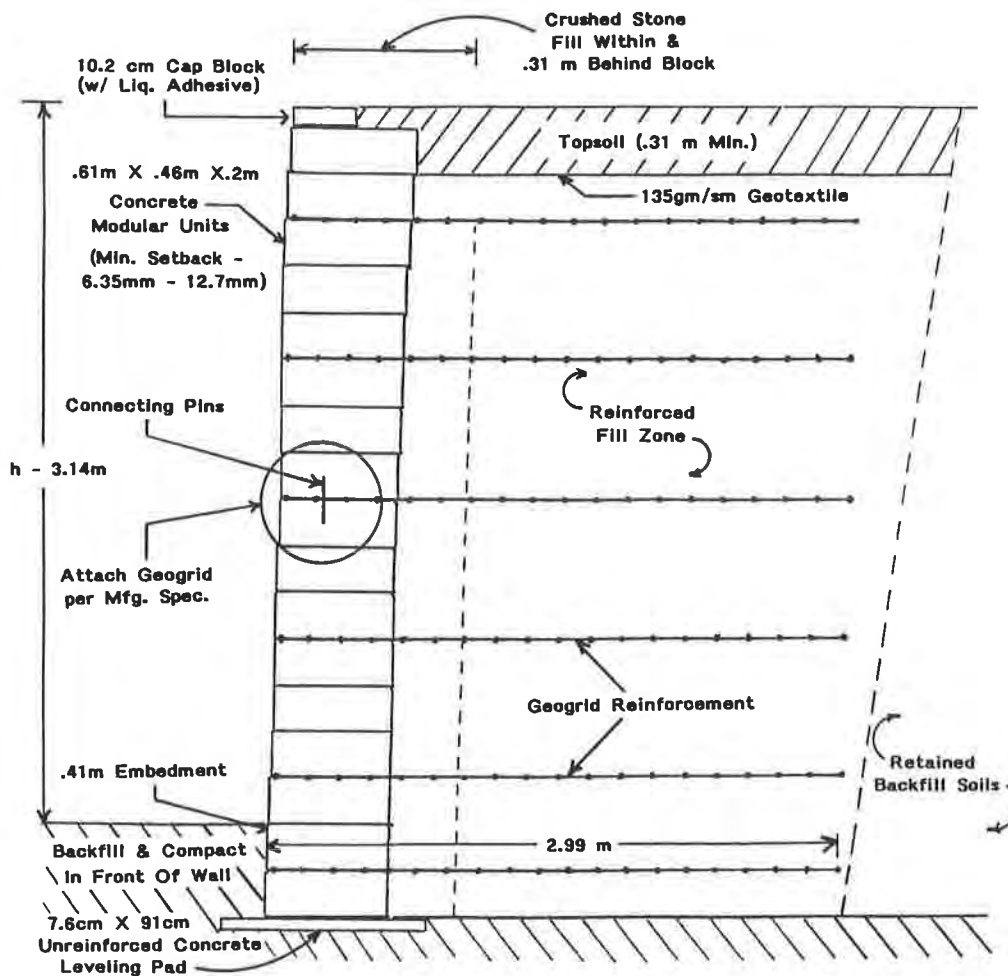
Cross-Section of Geosynthetically-Reinforced Wall LBW10 (2.75m) at 'Fiesta Texas'
